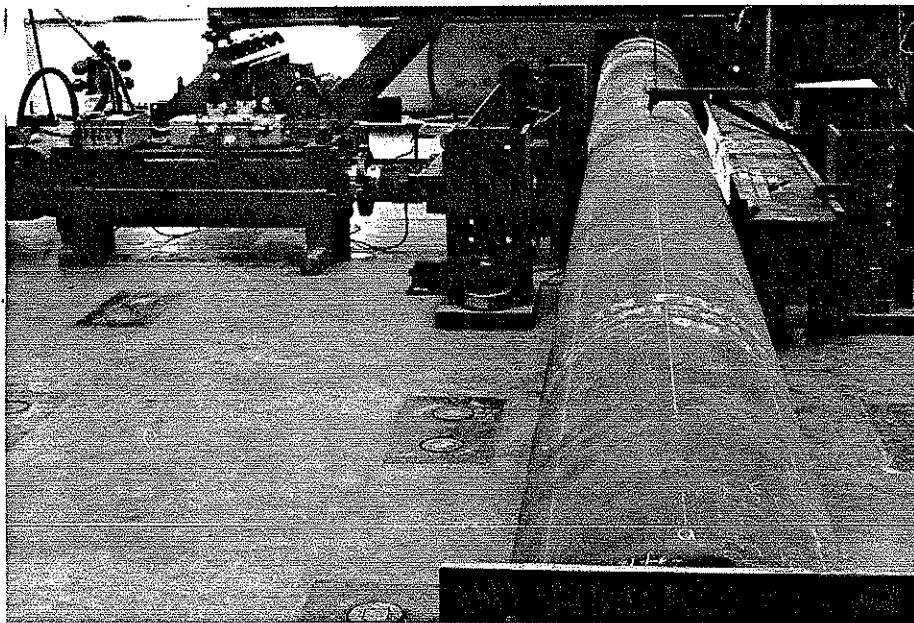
Setup for Denting with a Hydraulic Jack.
